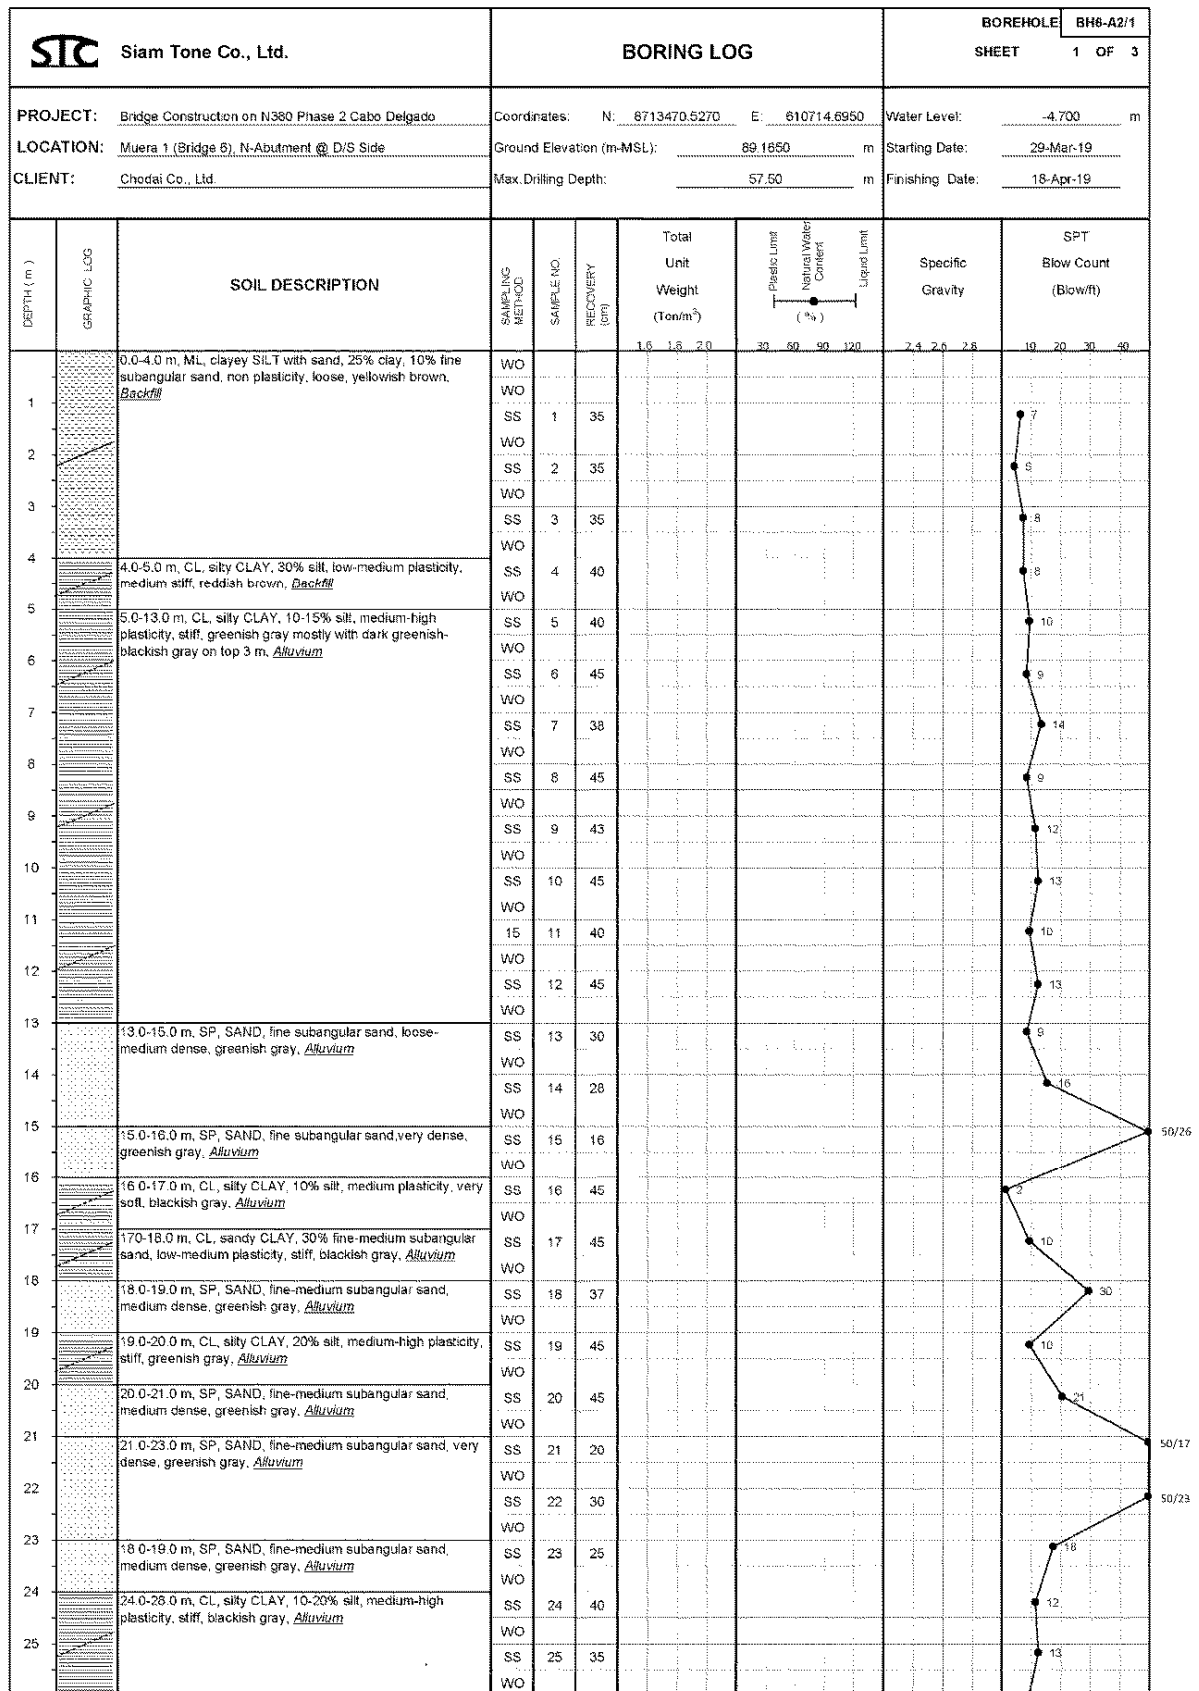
BH6-A2/1 at N-Abutment D/S Side of Muera I Bridge (B6)
